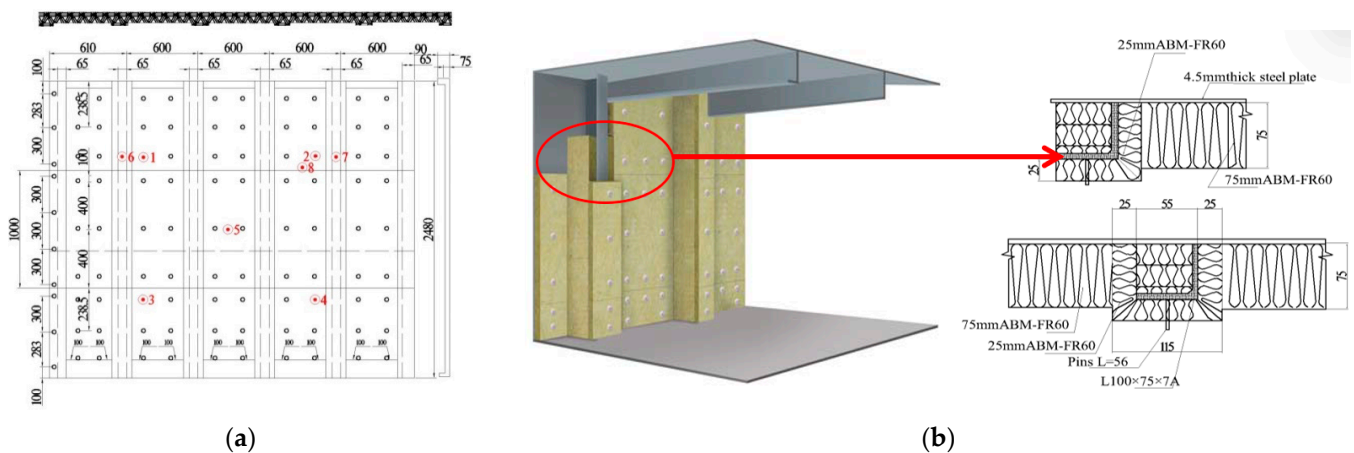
(a) Location of thermocouples on bulkhead A-60; (b) section of A-60 bulkhead specimen. (unit: mm).
